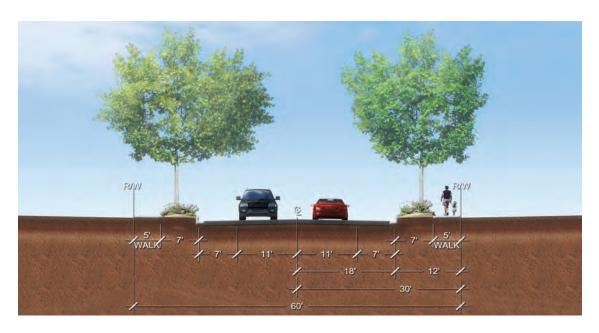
| Themed Road(s) - H Section (60' R.O.W.)
